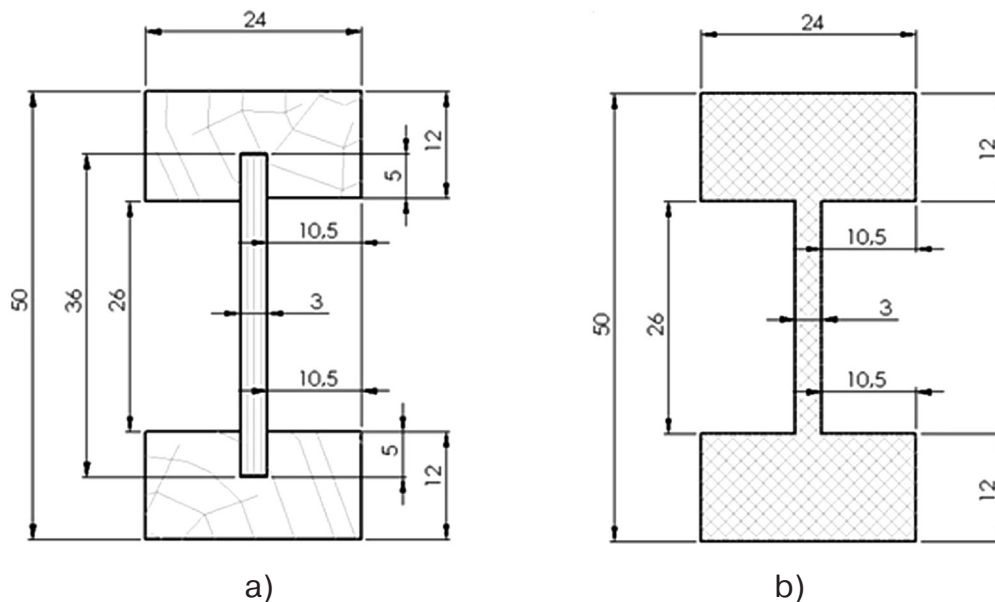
Scheme of I-joists. a) – wood and wooden composite I-joist; b) – plastic I-joist
